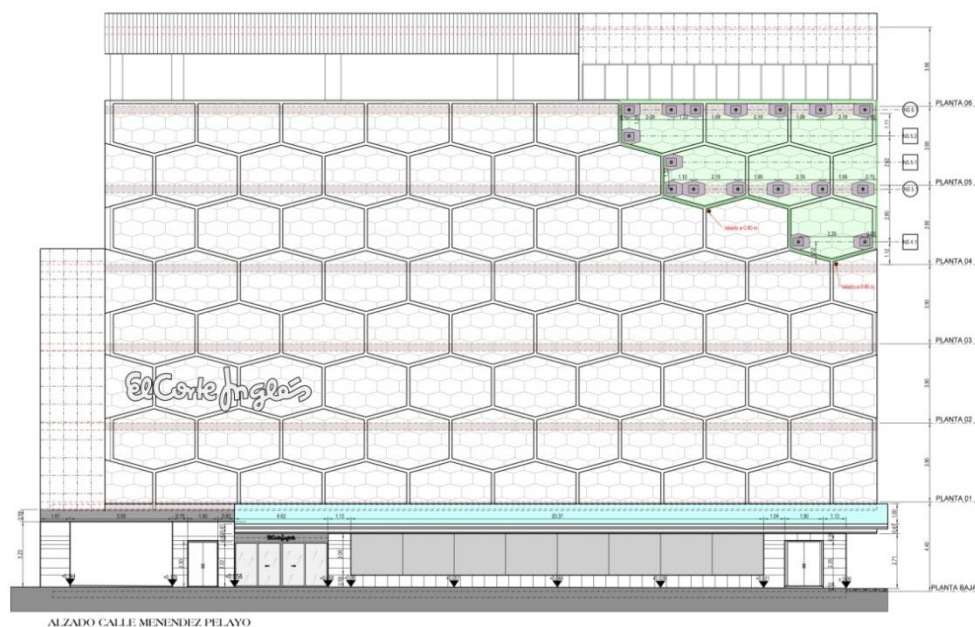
Camping structure on the east facade - Green facade in the Corte Inglés (Source: El Corte Inglés).
